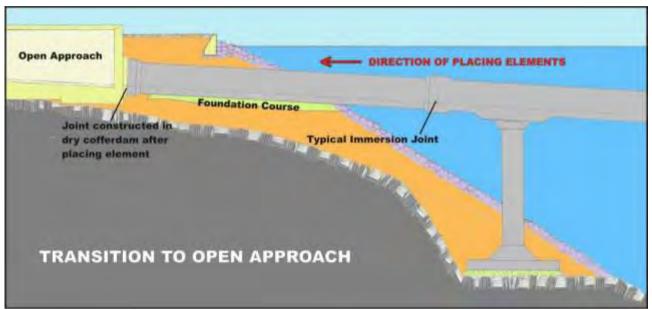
Detail at end of tunnel illustrates how the immersed bridge can seamlessly transition to an immersed tunnel in shallow water.
